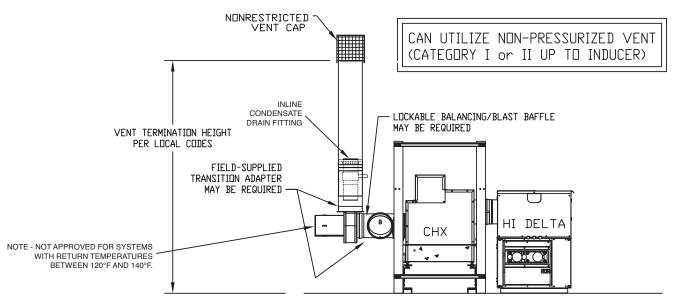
Outdoor Rear-Mounted CHX with Fixed-Speed Draft Inducer
